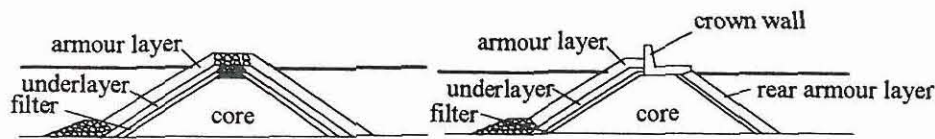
Examples of typical rubble mound breakwater cross sections, with out a crown wall and with a crown wall
